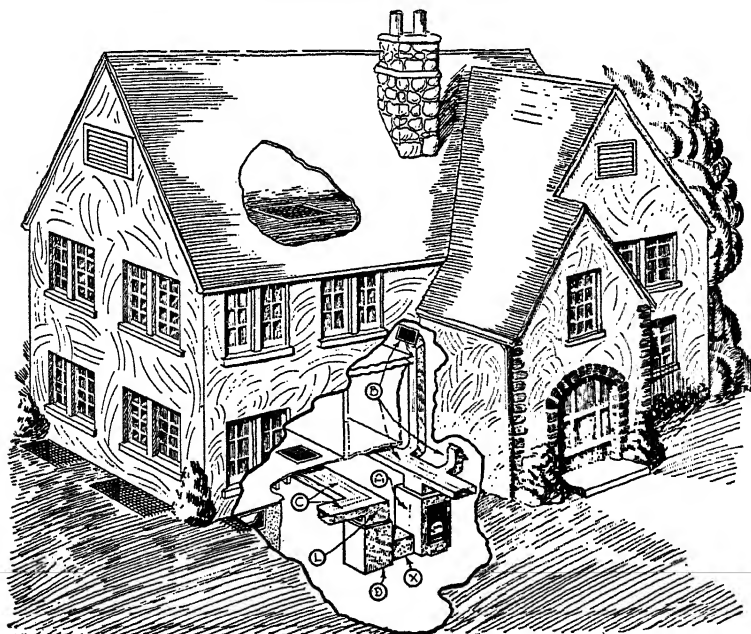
Section of Typical Residence Showing Installation of a Mechanical Furnace System
